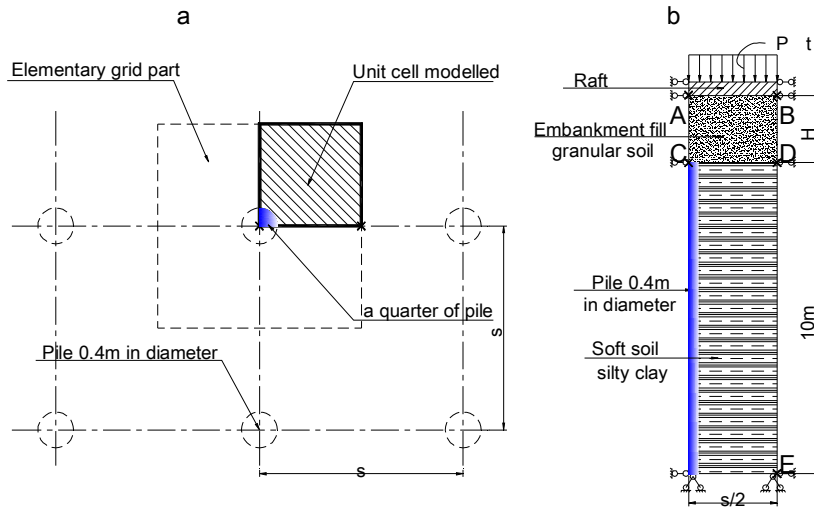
Layout of the simulated unit cell (a) plan (b) elevation view
